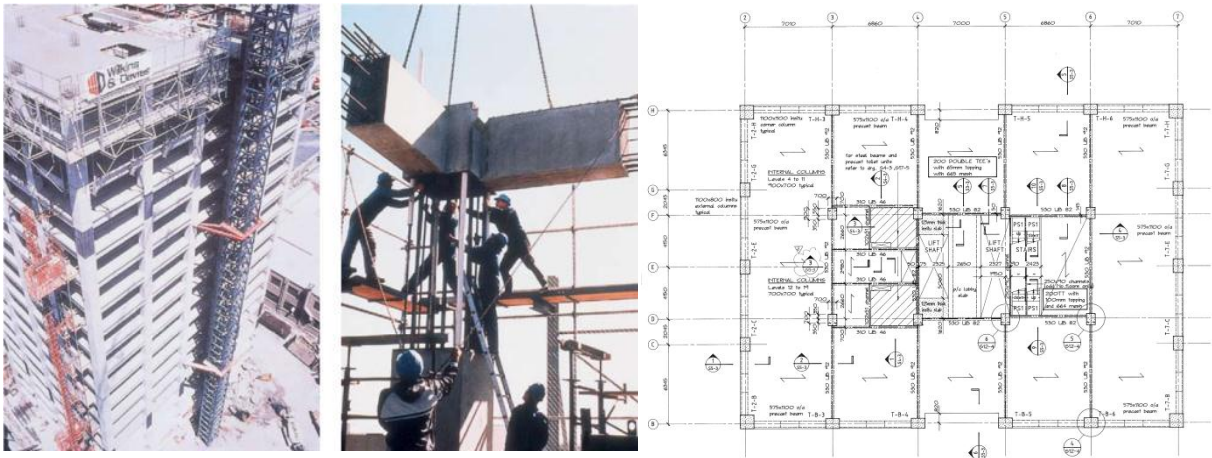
Beam plastic hinges in a 22-storey reinforced concrete building constructed in mid-end 1980s (currently under demolition). Top Left; photo of building under construction (courtesy of Restrepo).
